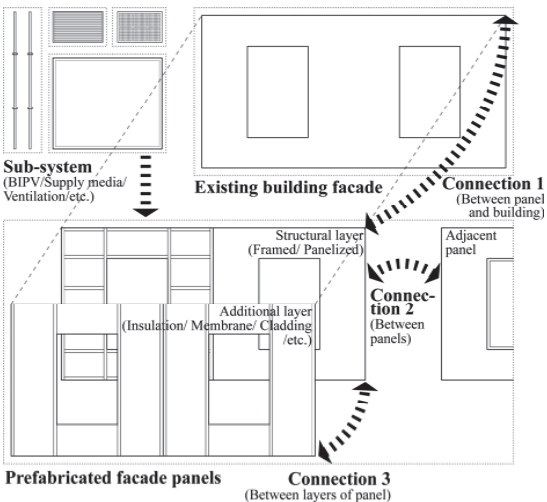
Diagram of layers and connections within a prefabricated façade system for renovation
